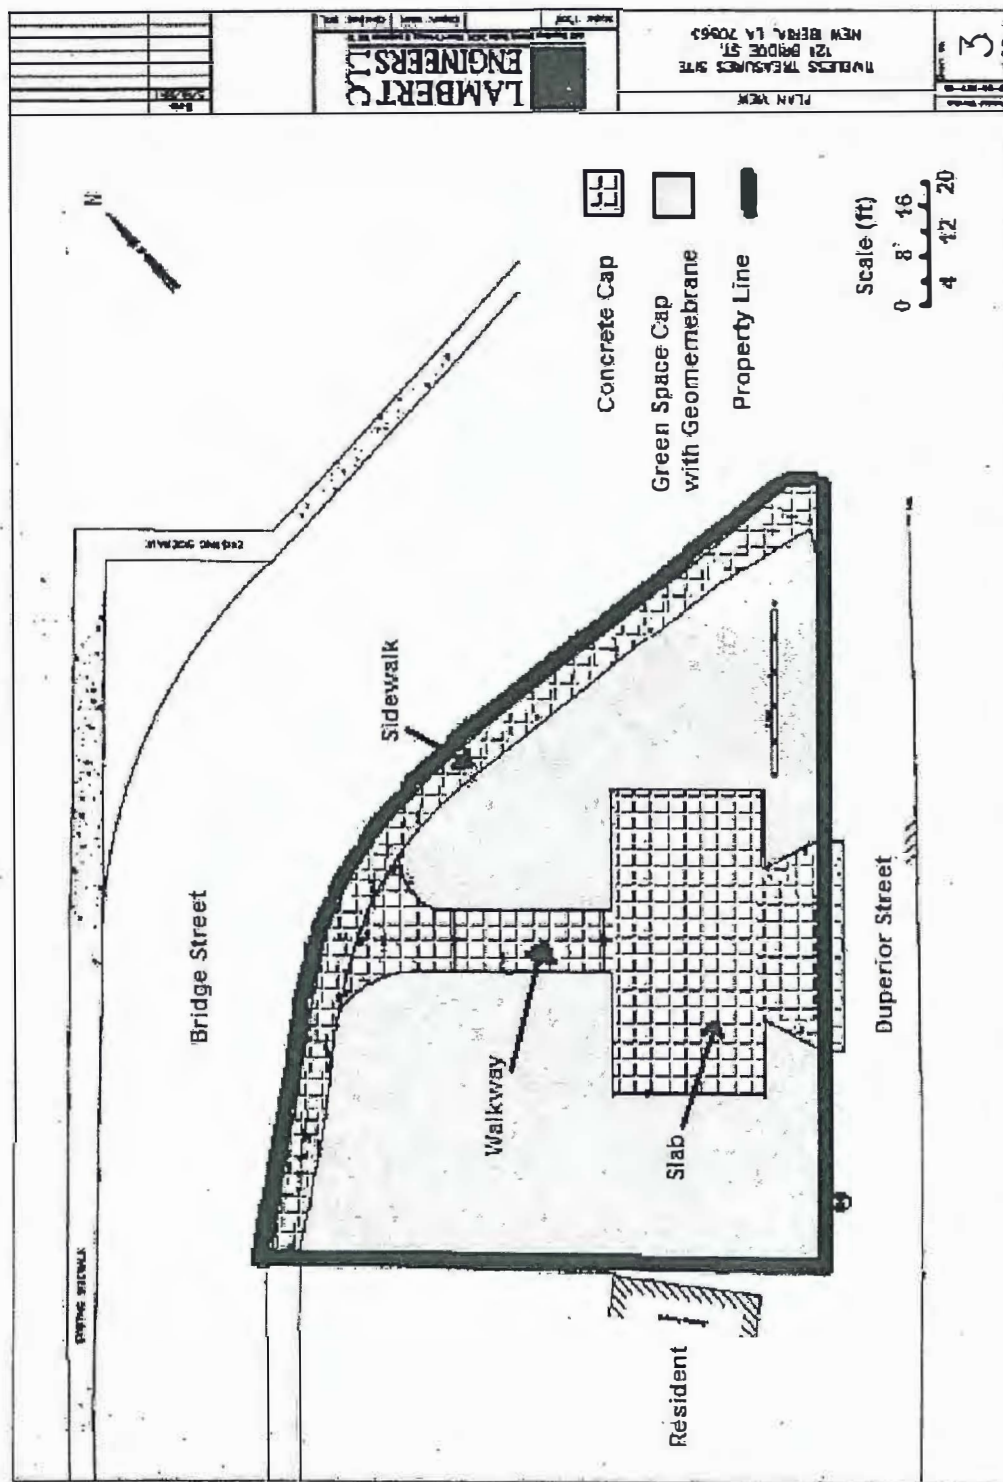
Concrete cap (sidewalk, walkway and building slab) and green space cap (with geomembrane) across entire site.
